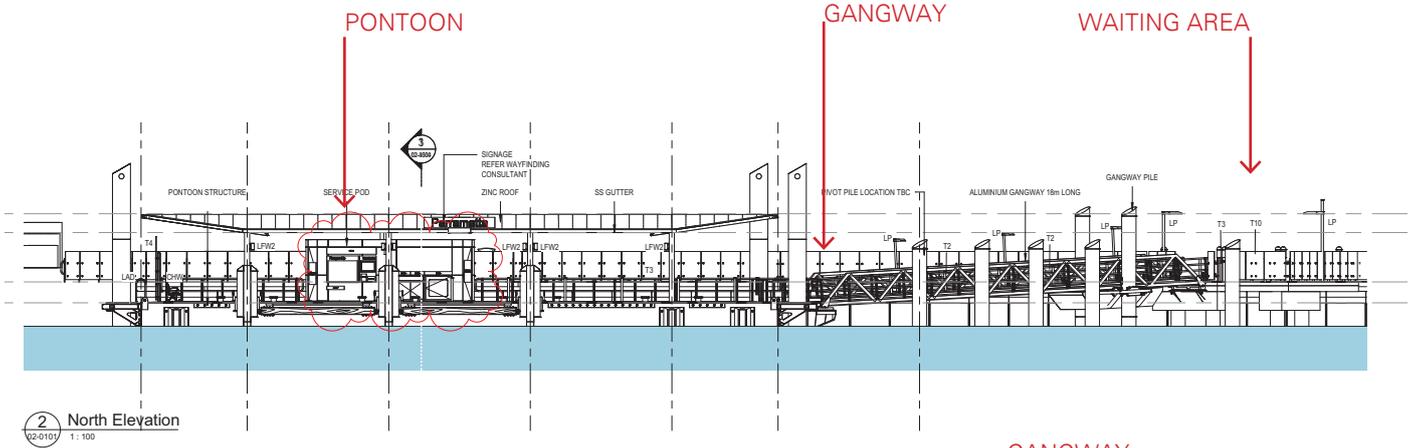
Architectural elevations of proposed wharf structure (plan courtesy of Conrad Gargett Ancher Mortlock Woolley)
